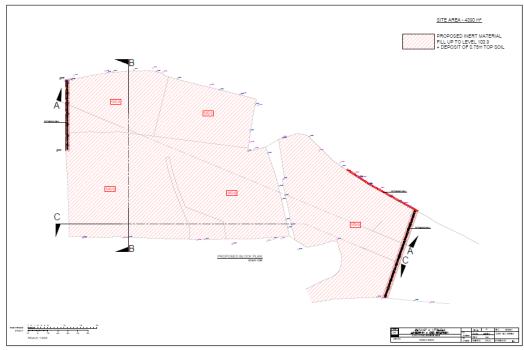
Project outline, showing the area proposed to be backfilled with inert material and covered with 0.75m top soil (*Source*: PDS Appendix).
